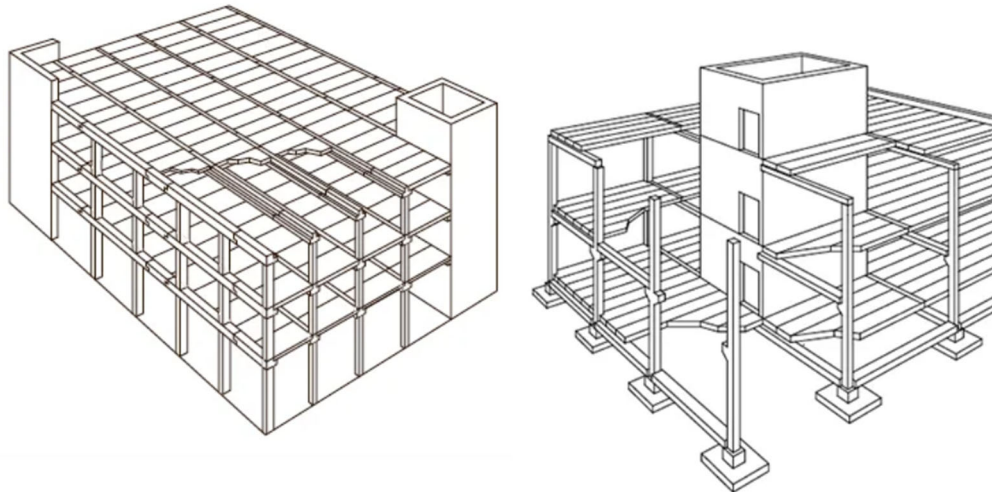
Prefabricated concrete wall elements used as stair shafts and as part of the load-bearing structure.⁵⁰
